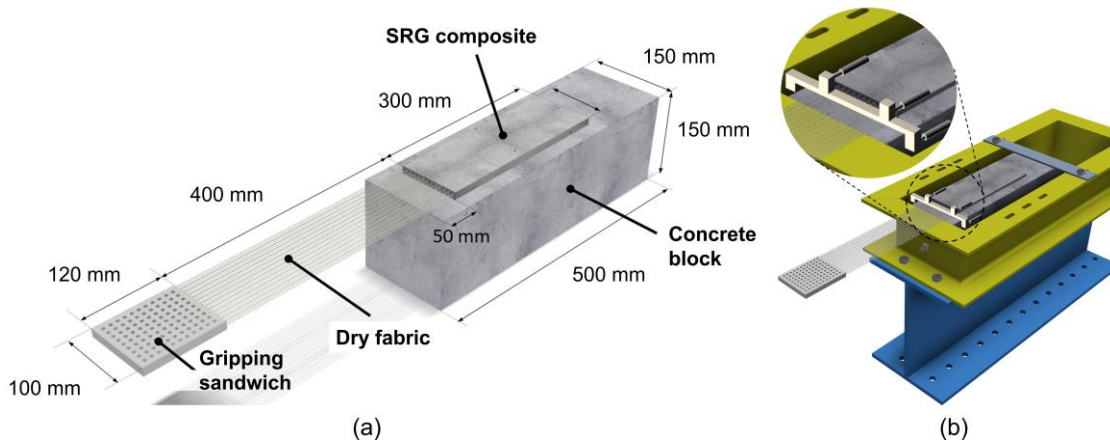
(a) Geometry of specimens and (b) setup of single-lap shear bond test with a zoomed view on the loaded area.
